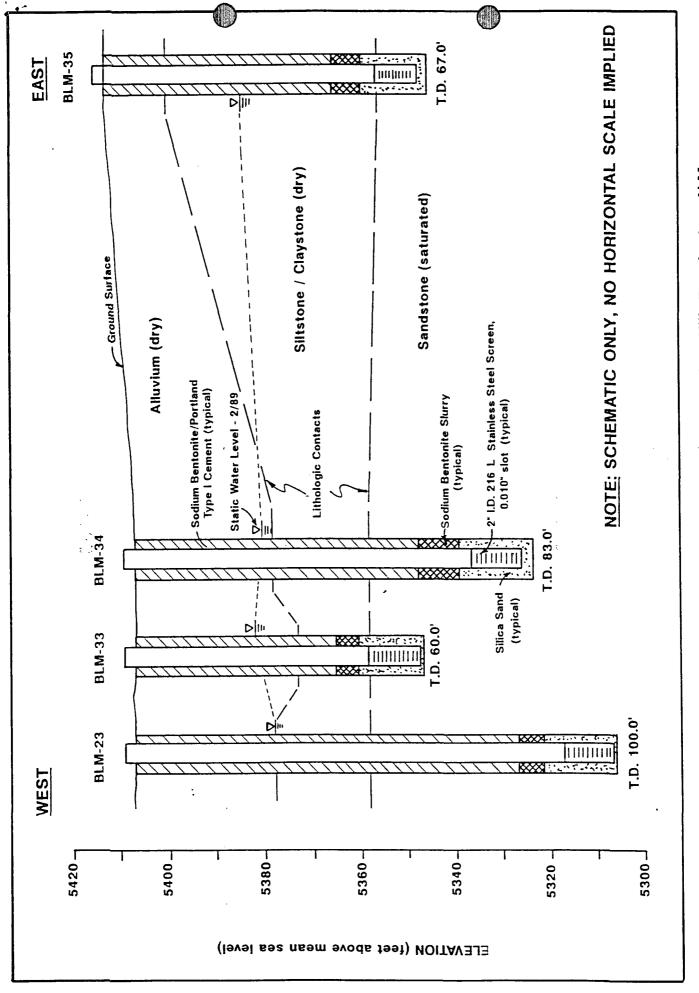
SCHEMATIC CROSS-SECTION - Lee Acres Landfill, Farmington, N.M.
